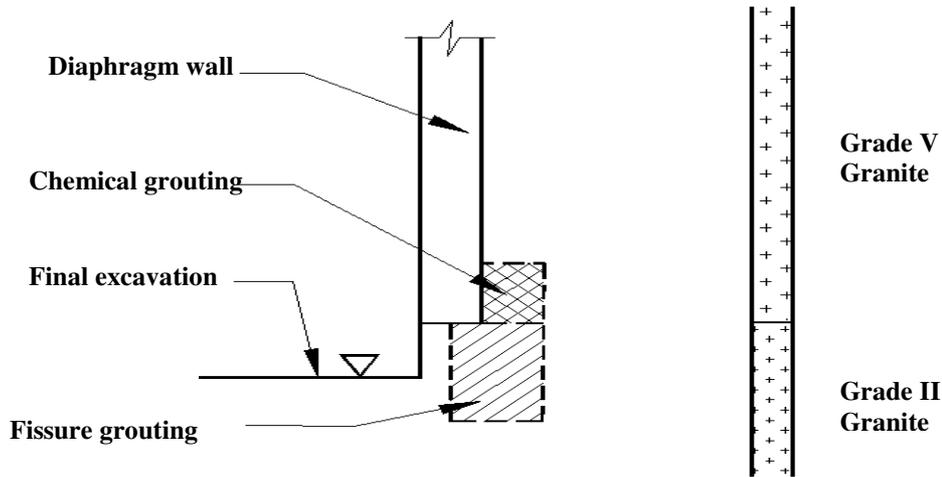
Grouting for diaphragm wall founded above final excavation level
